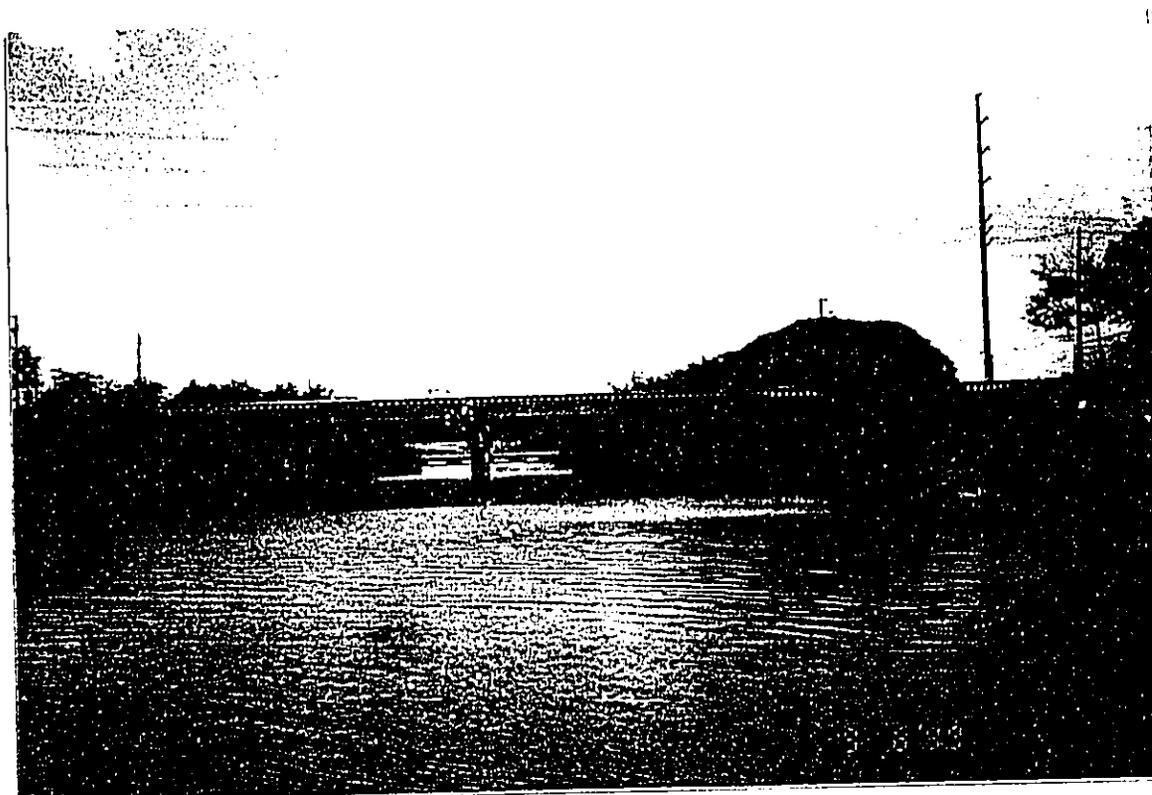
View of the project site looking west. Note: the foot-path Bridge in the distance.
